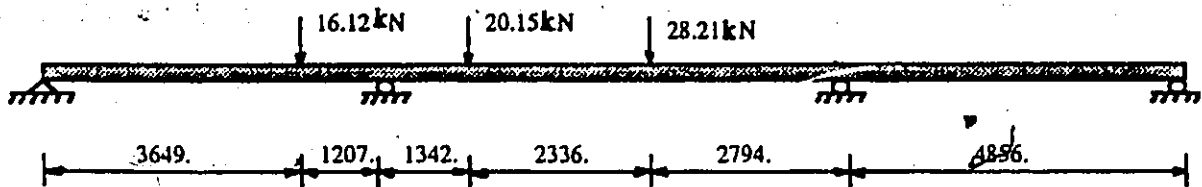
Load Position in the S.S. Slab-on-Girder Bridge
